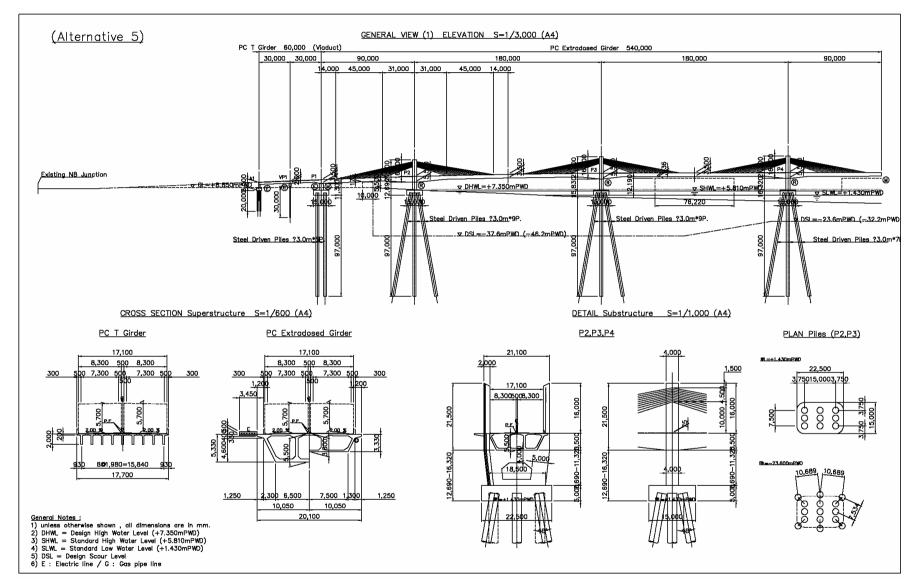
Typical Structure and Cross-section(Alternative-H3)
